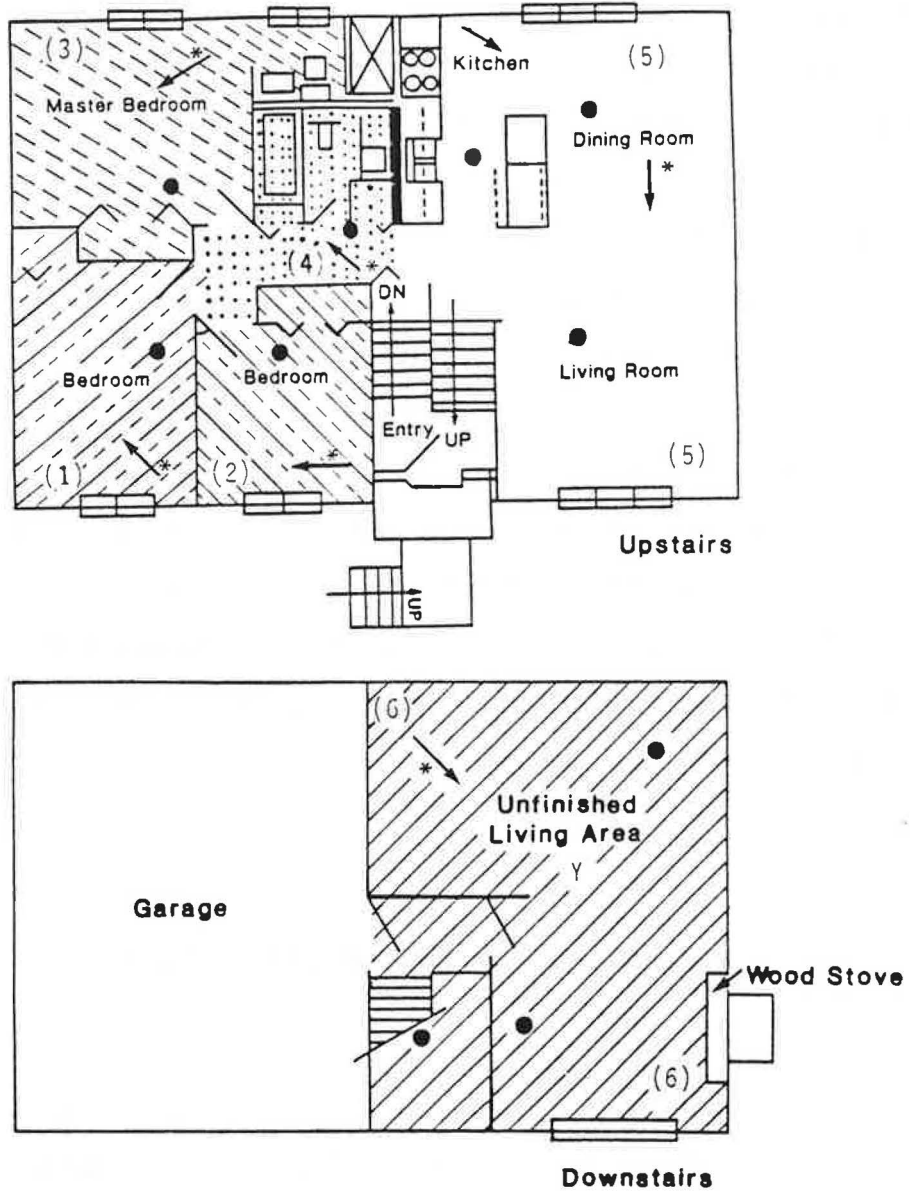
Floor plan of the control house with six zones defined for constant concentration measurements. SF₆ injection points (*), mixing fans (->), and sampling points (•) are shown for each zone.
